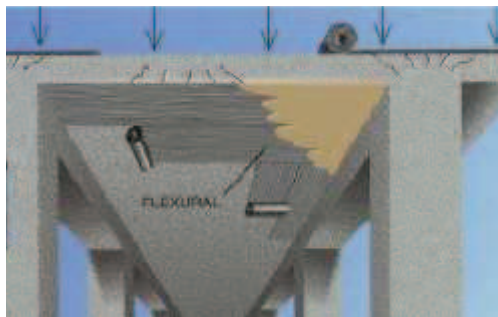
Application of FRP on reinforced concrete slab for seismic retrofitting
